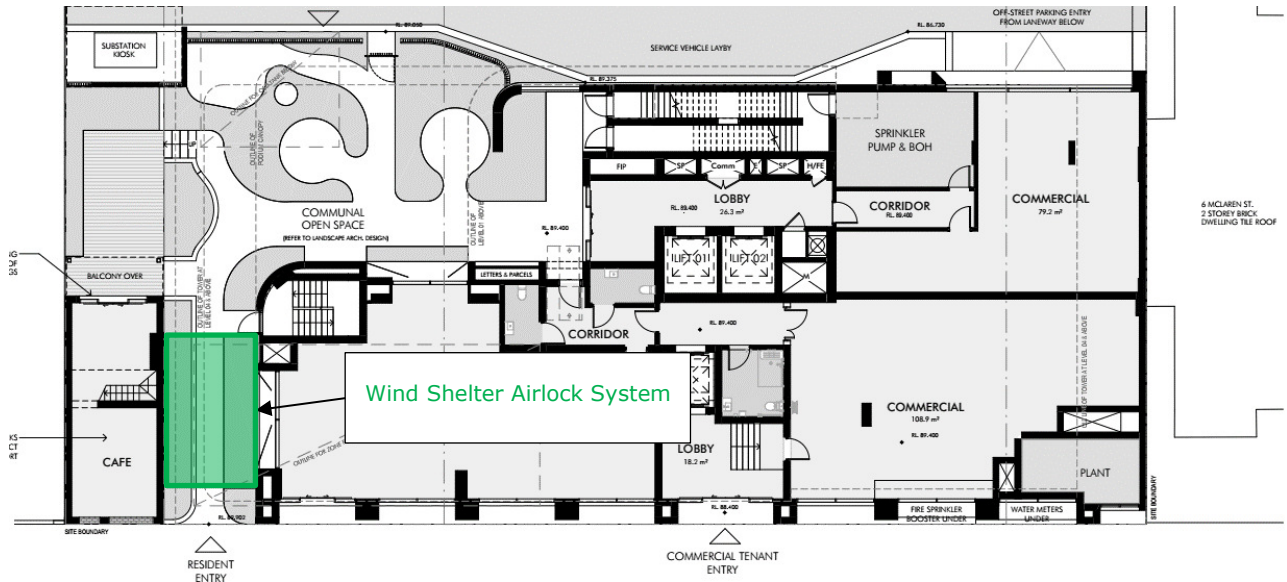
Ground floor plan with the recommended wind control measures overlaid.
